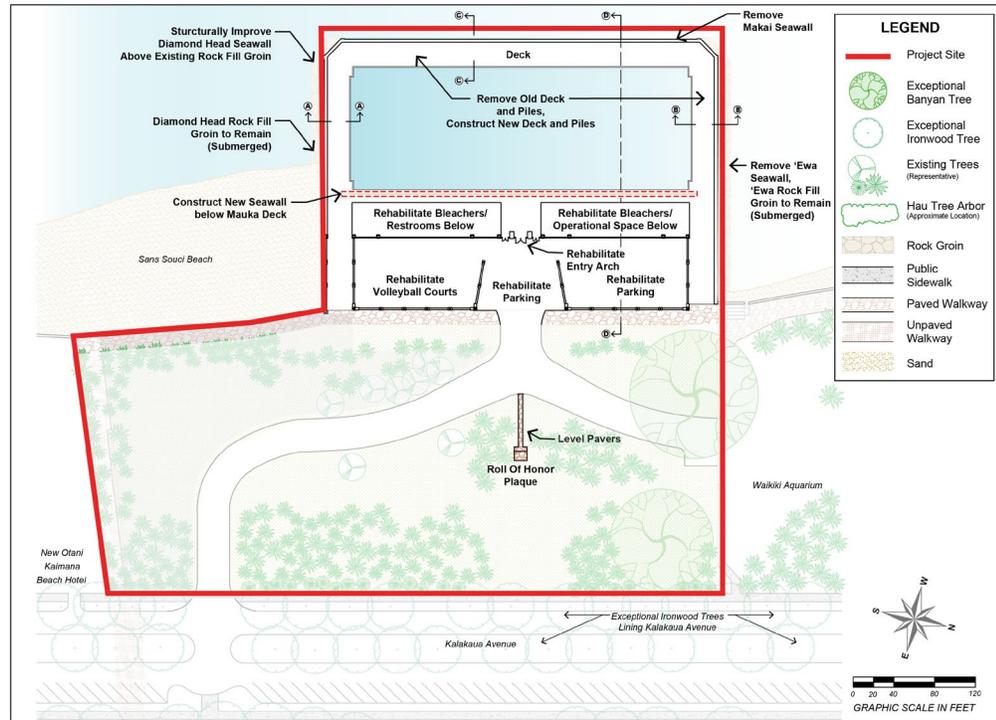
Perimeter Deck – Proposed Changes (Plan View)
